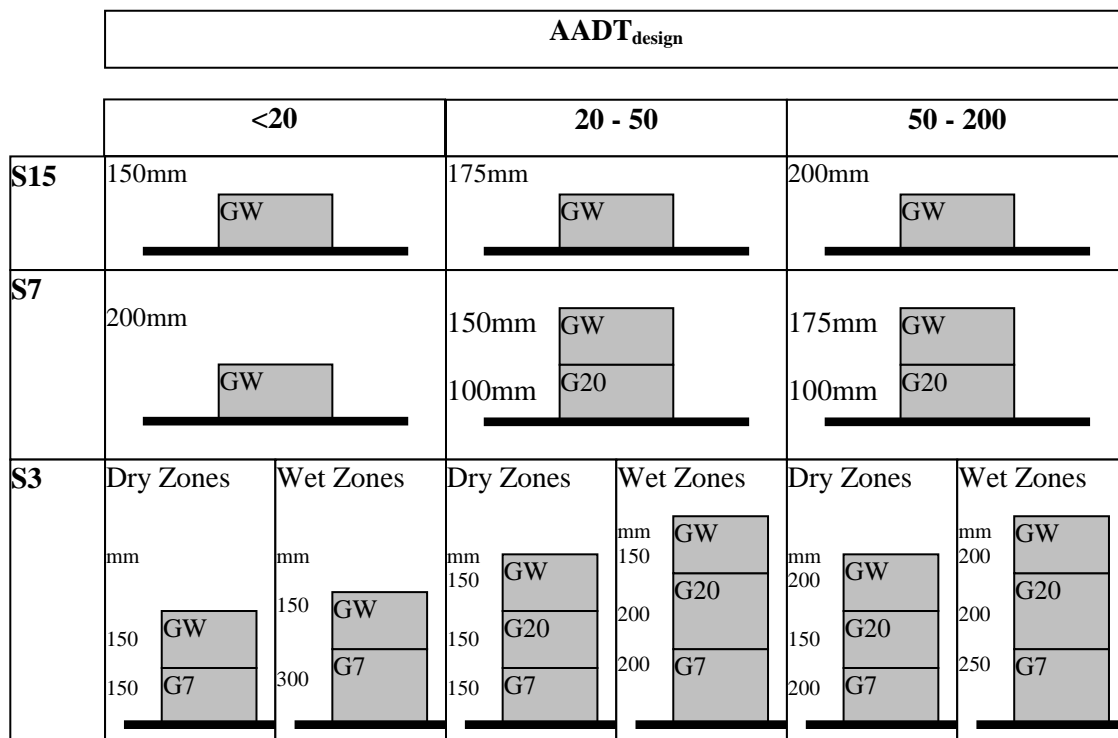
Pavement and Improved Subgrade for Gravel Roads for AADTs < 200
